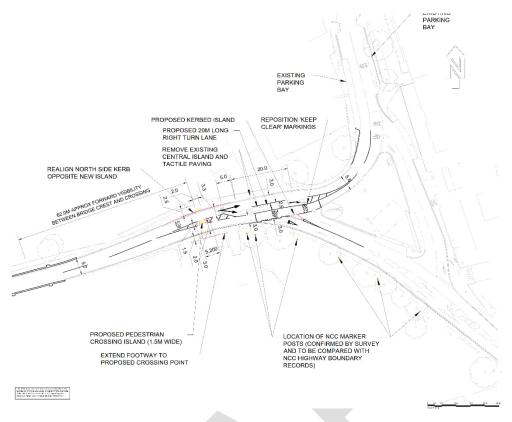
B1150 Norwich Road Proposed Infrastructure Change Layout
